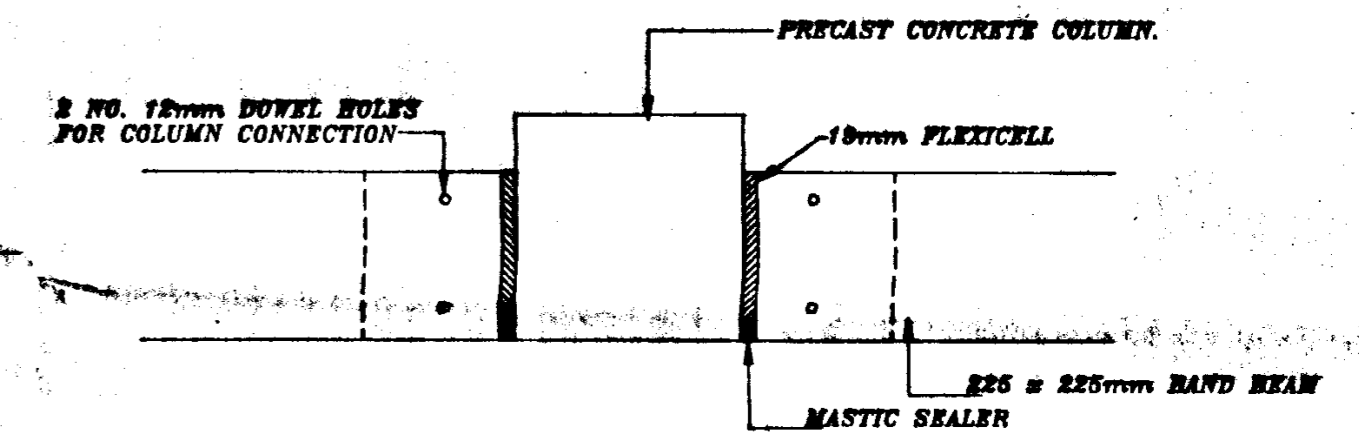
DETAIL 'A'. scale 1:5. WHERE 225mm BLOCK ABUTTS COLUMN.
